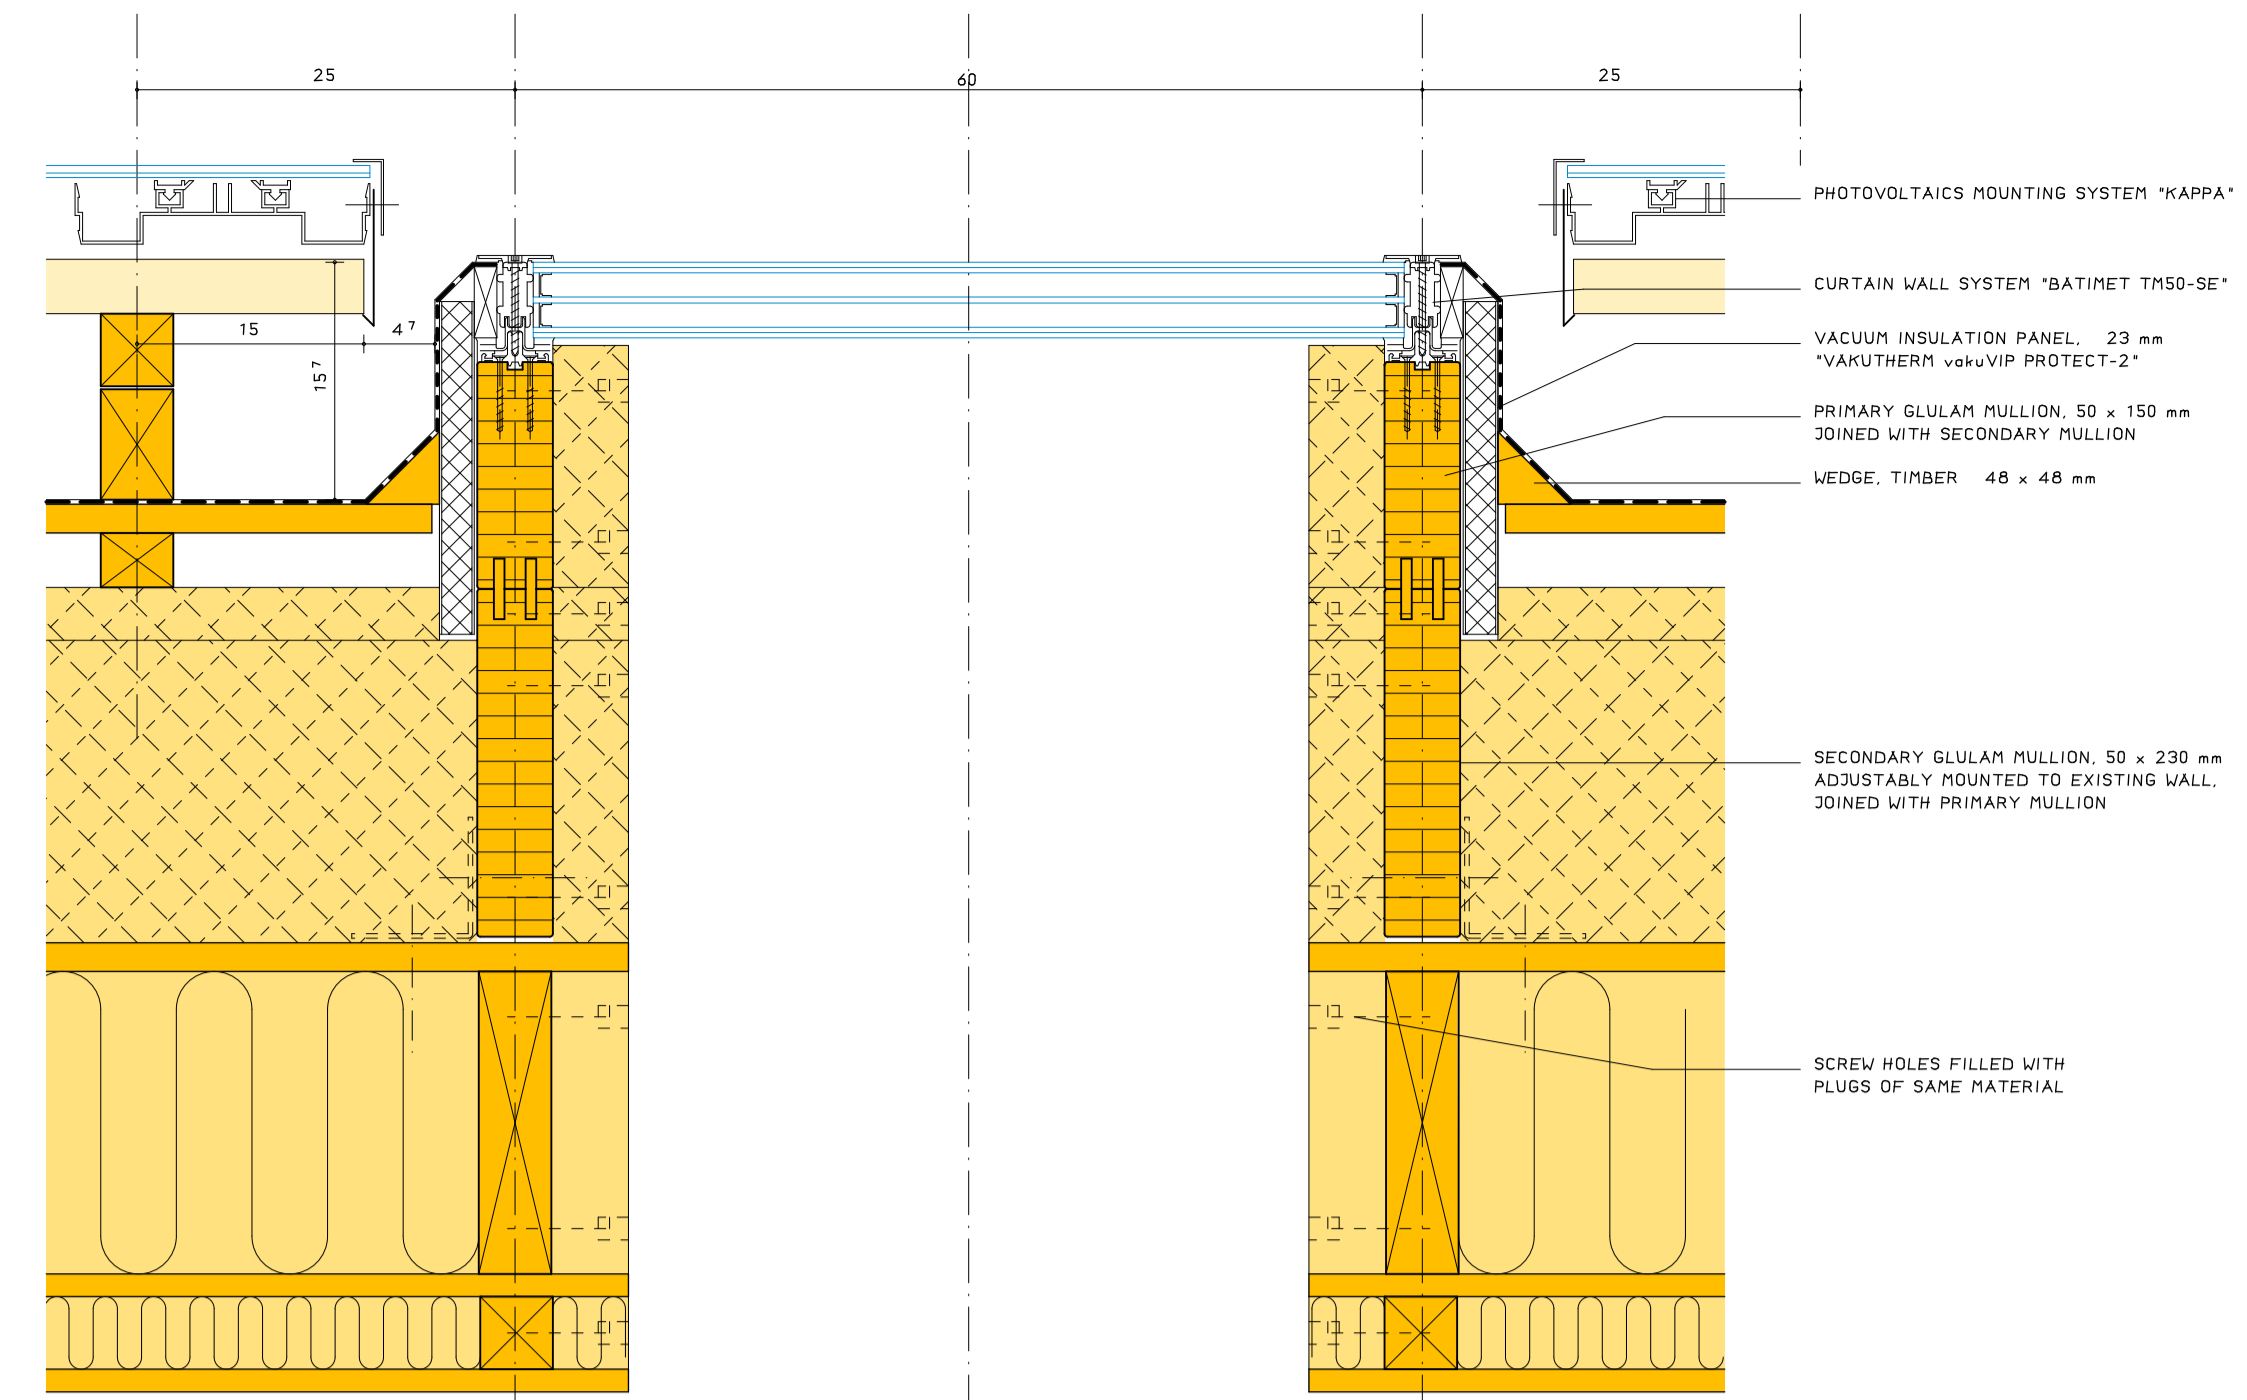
DETAIL "MATTA C." - WALL GROUND FLOOR - FIRST FLOOR 1 : 5
